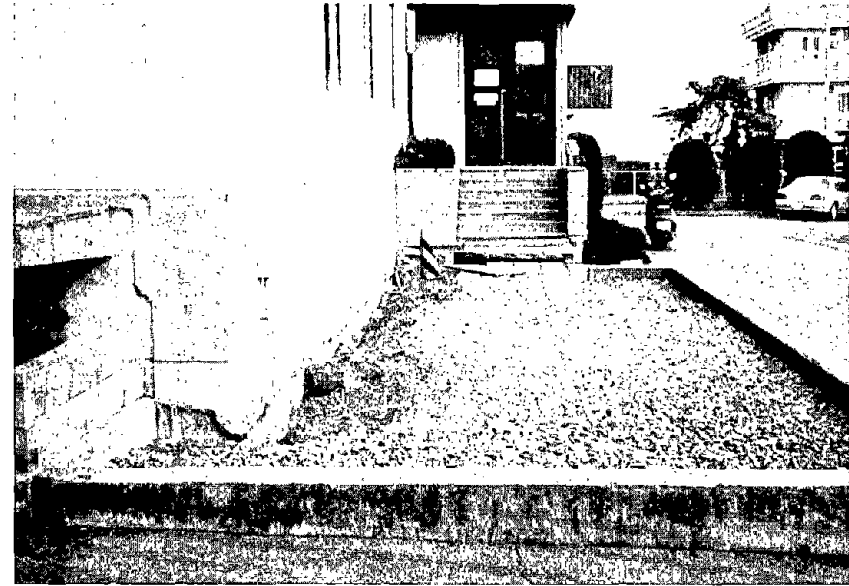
Limited settlement of treated ground adjacent to pile-supported building, southeast corner of Port Island Phase I.
